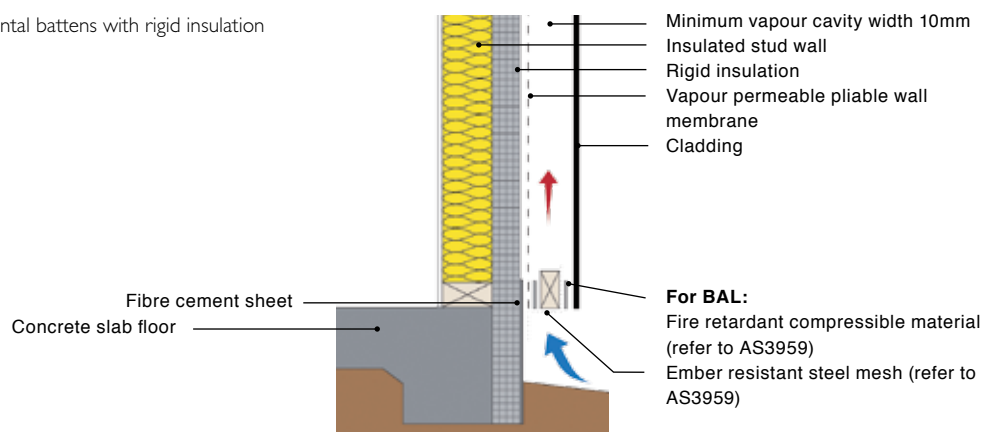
Concrete floor with horizontal battens with rigid insulation
